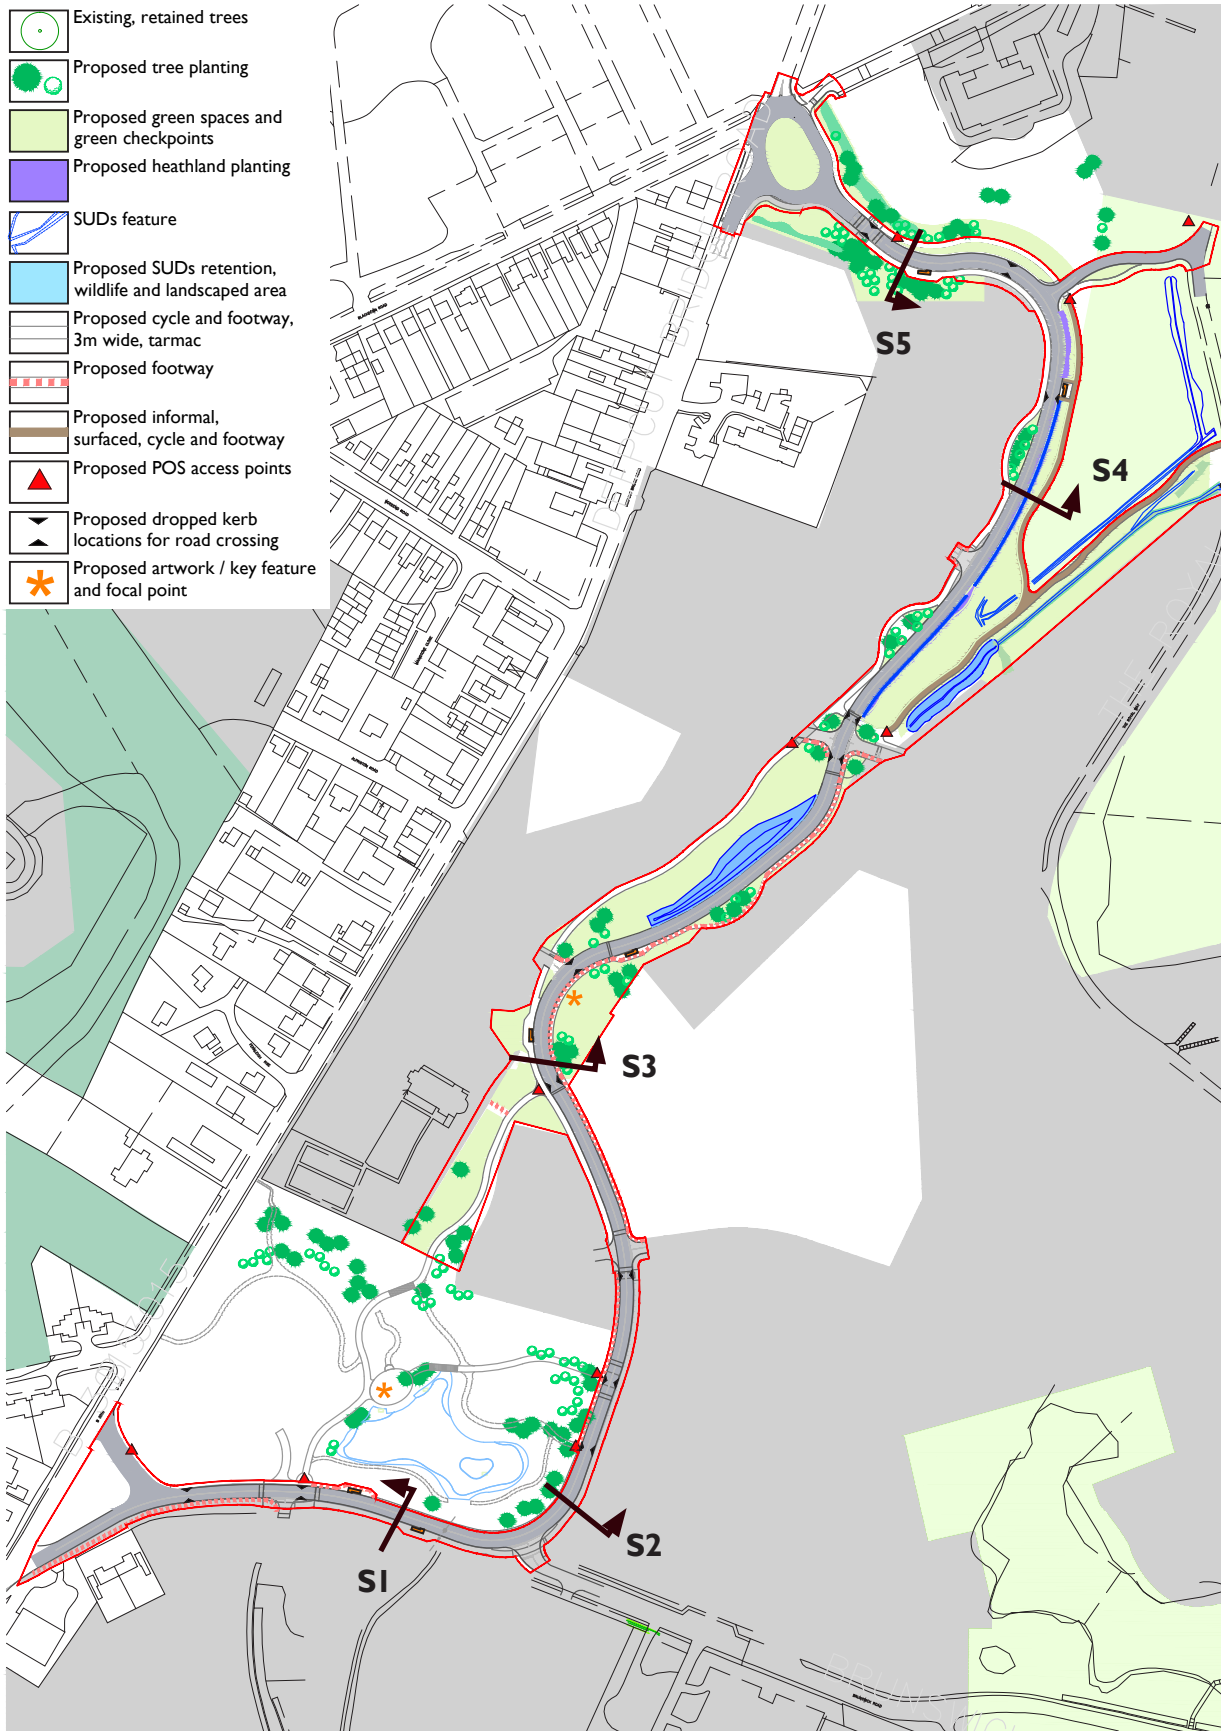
Mindenhurst Road and NAR Illustrative Masterplan with section locations
